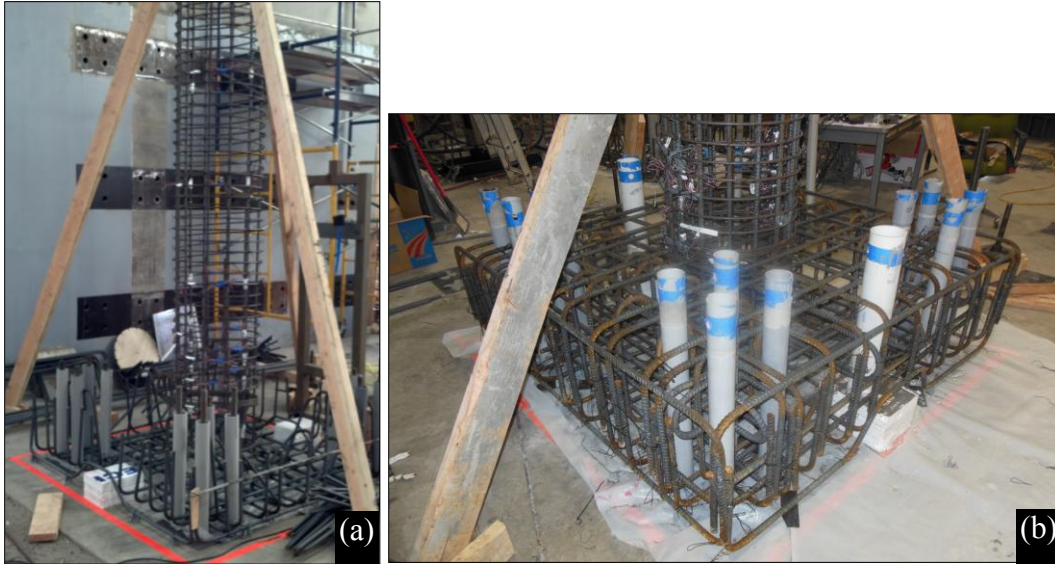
Photograph of the placement of reinforcement for: (a) column, and (b) footing
